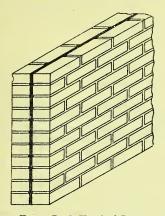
Tenax Rock Vertical Damp-proofing.
